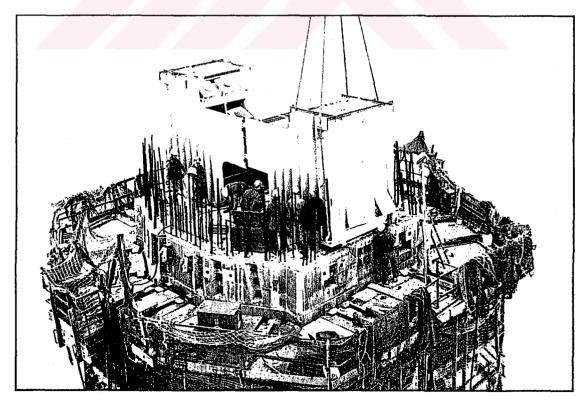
INSTALLATION OF AN ANCHORAGE BOX (Courtesy of AFPC, 1994)
